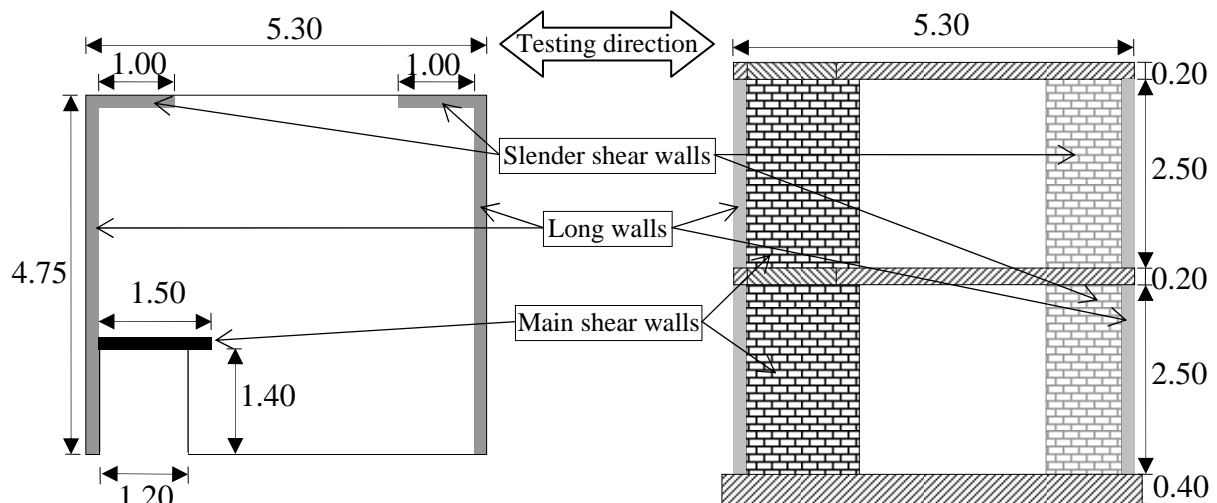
The test specimen: plan and elevation (dimensions in meters)
